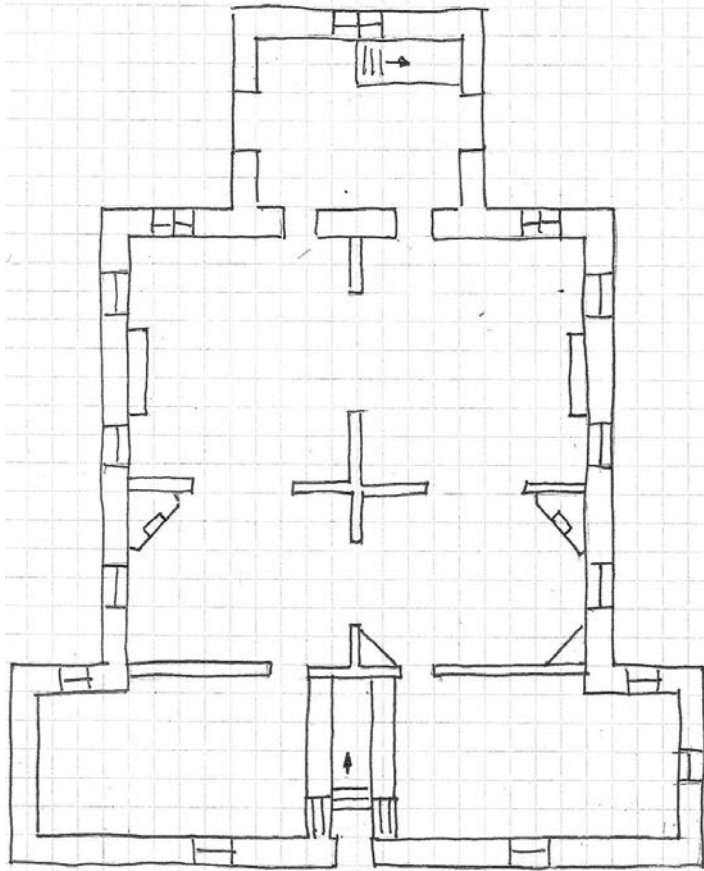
First floor plan (north at right). Sketch by Neil Larson.
